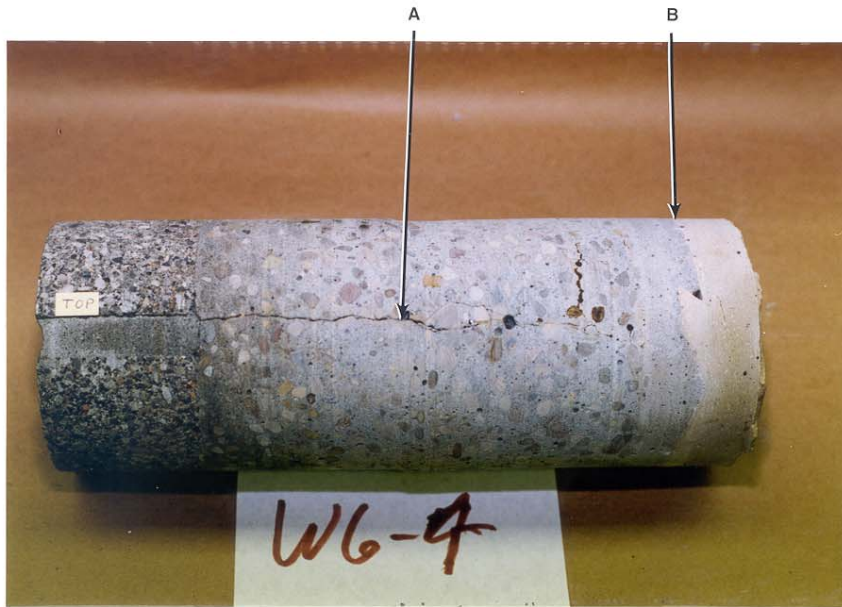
"A" shrinkage or thermal crack starting at a mortar joint in the insulating block wall. "B" sand/cement mix placed behind a tile which was replaced.
